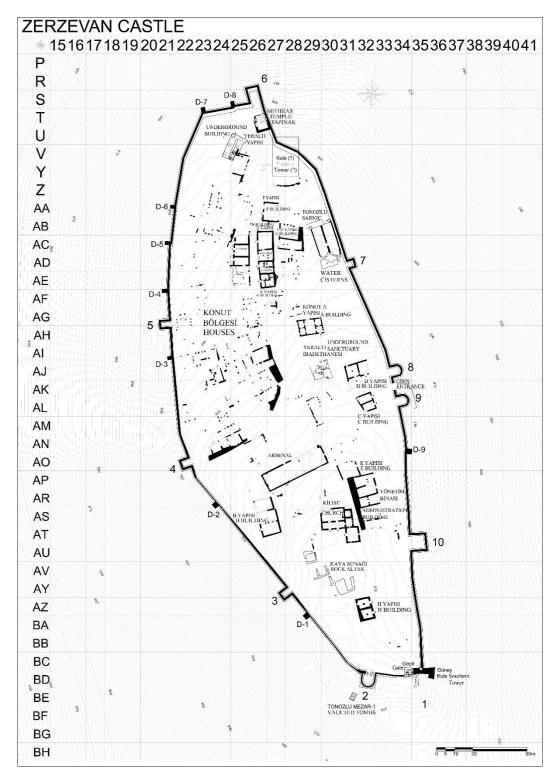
Castrum Zerzevan, Topographical Plan. (Zerzevan Excavation Archive)
